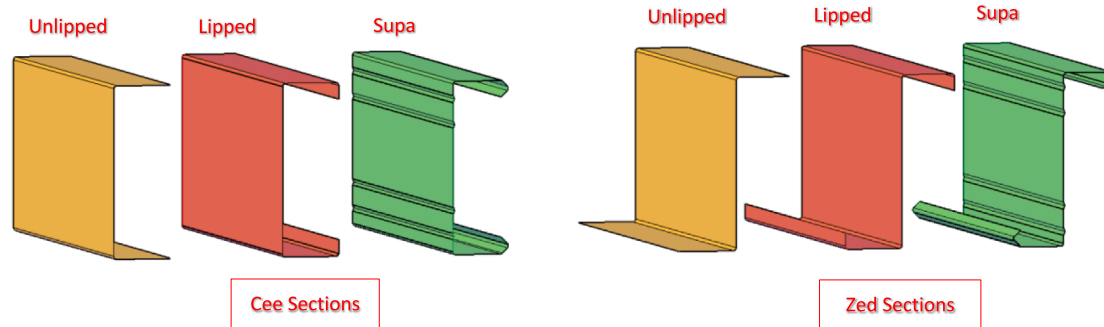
Cold-formed steel (CFS) sections: Cee and Zed sections.
